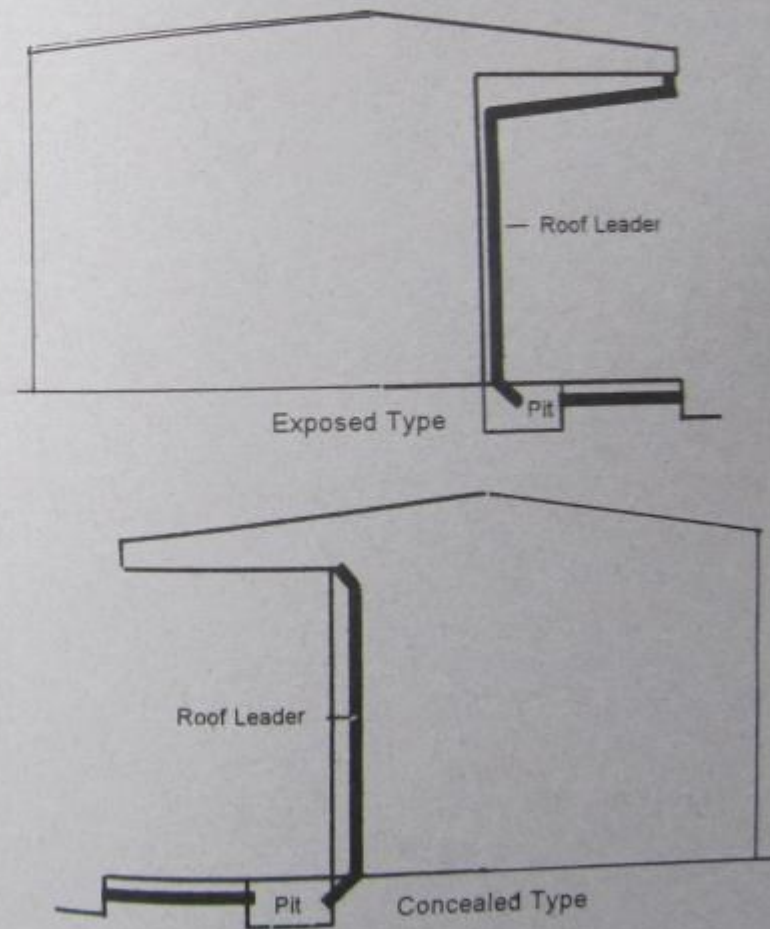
EXPOSED AND CONCEALED TYPE ROOF LEADER
